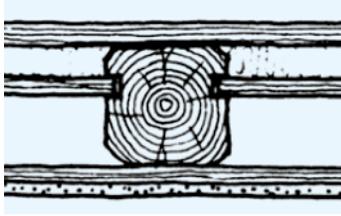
Horizontal partition by timber beams. From the top: floor board, clay infill, wooden boards, empty space, wooden boards and a layer of plaster on straw. The timber beams are 200 mm by 200 mm with a tolerance from top to bottom of 6.25 mm
